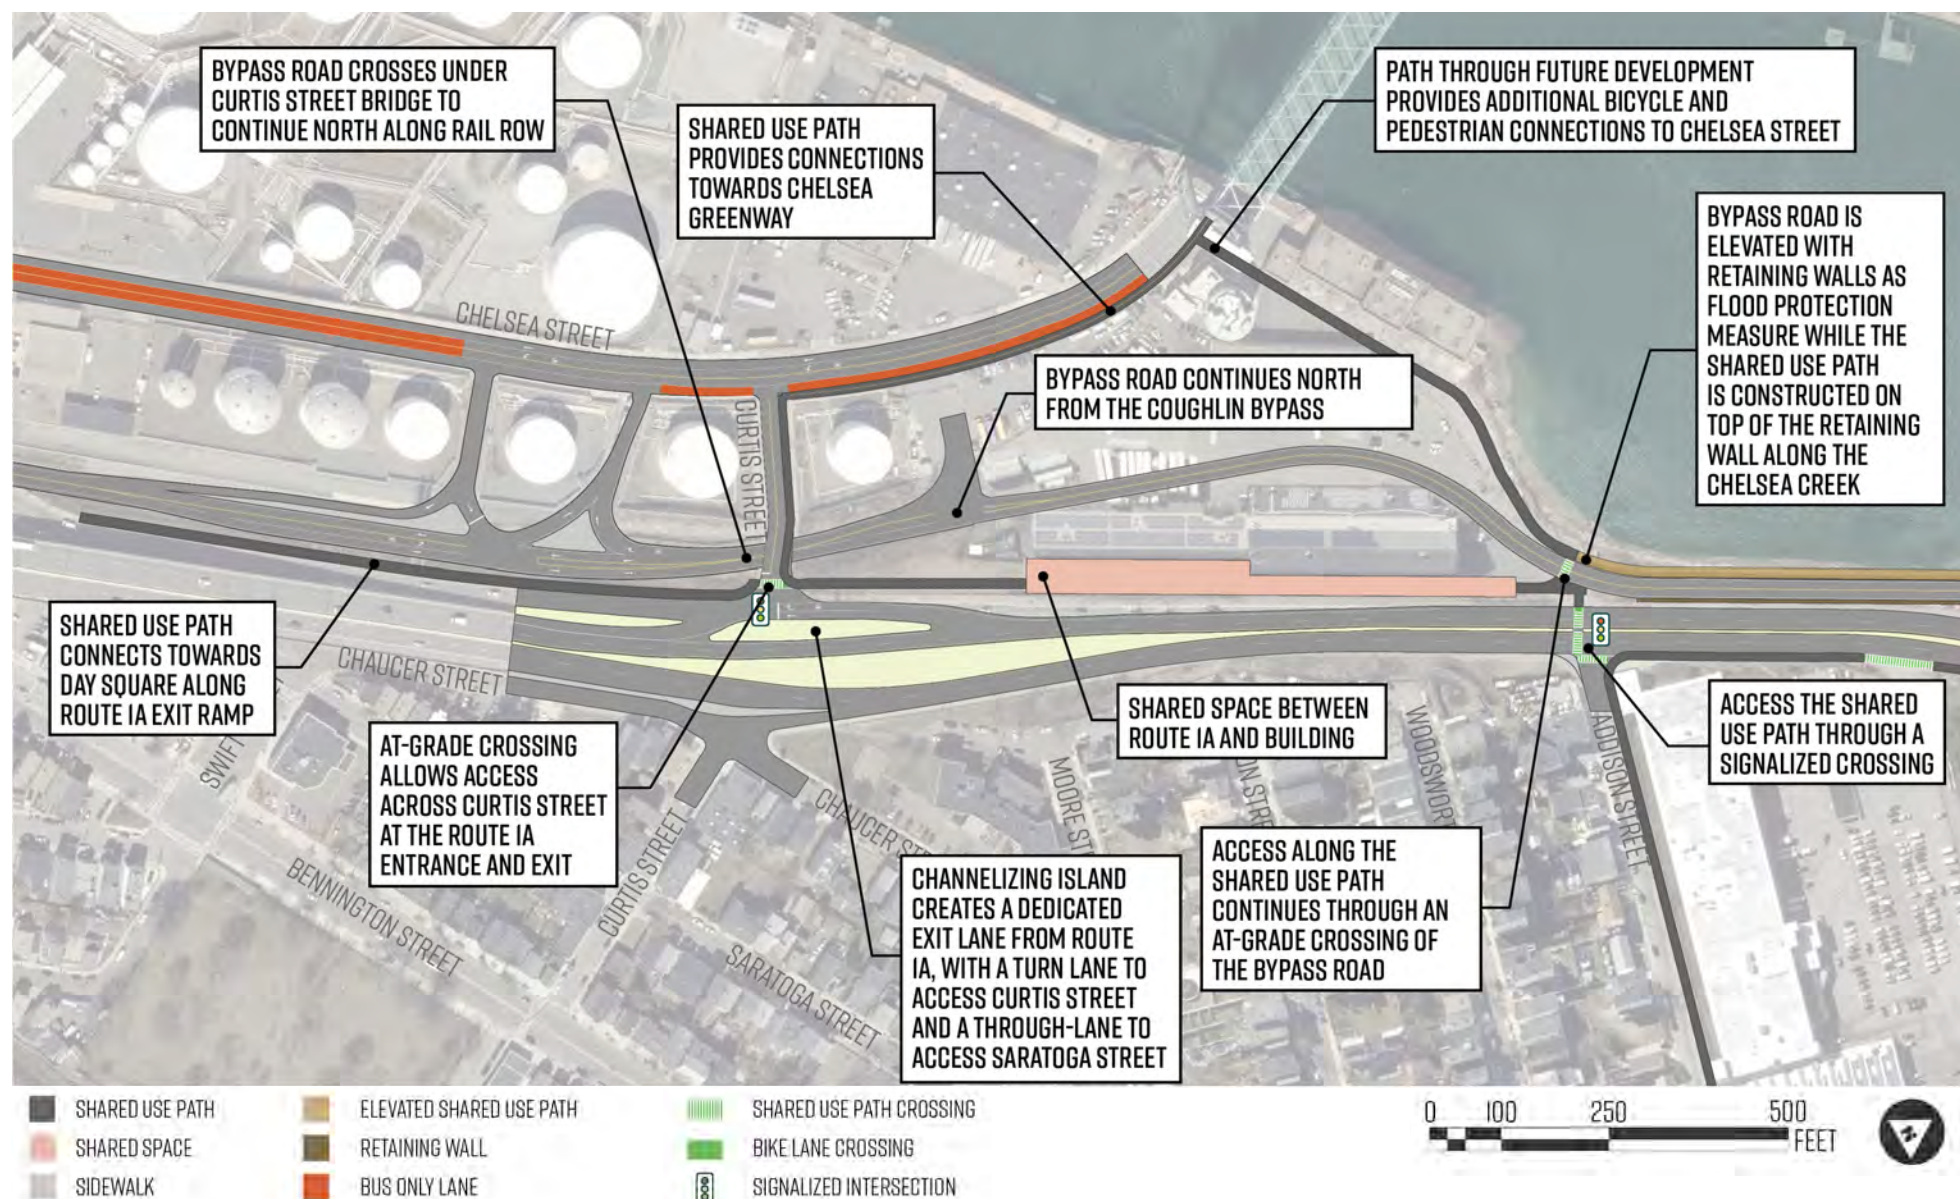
Bypass Road with Shared Use Path (SUP) – Curtis Street to Addison Street
